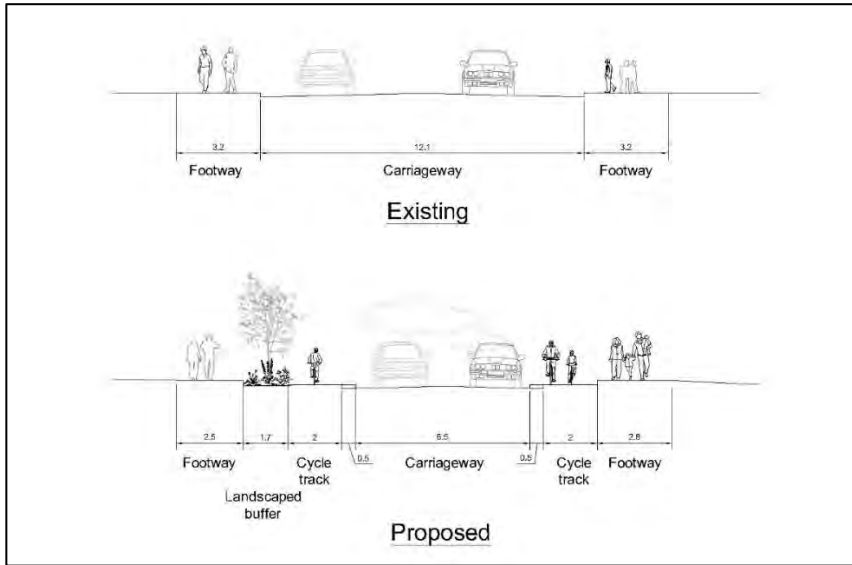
Ashgrove Road West illustrative street view (before and after facing west)
